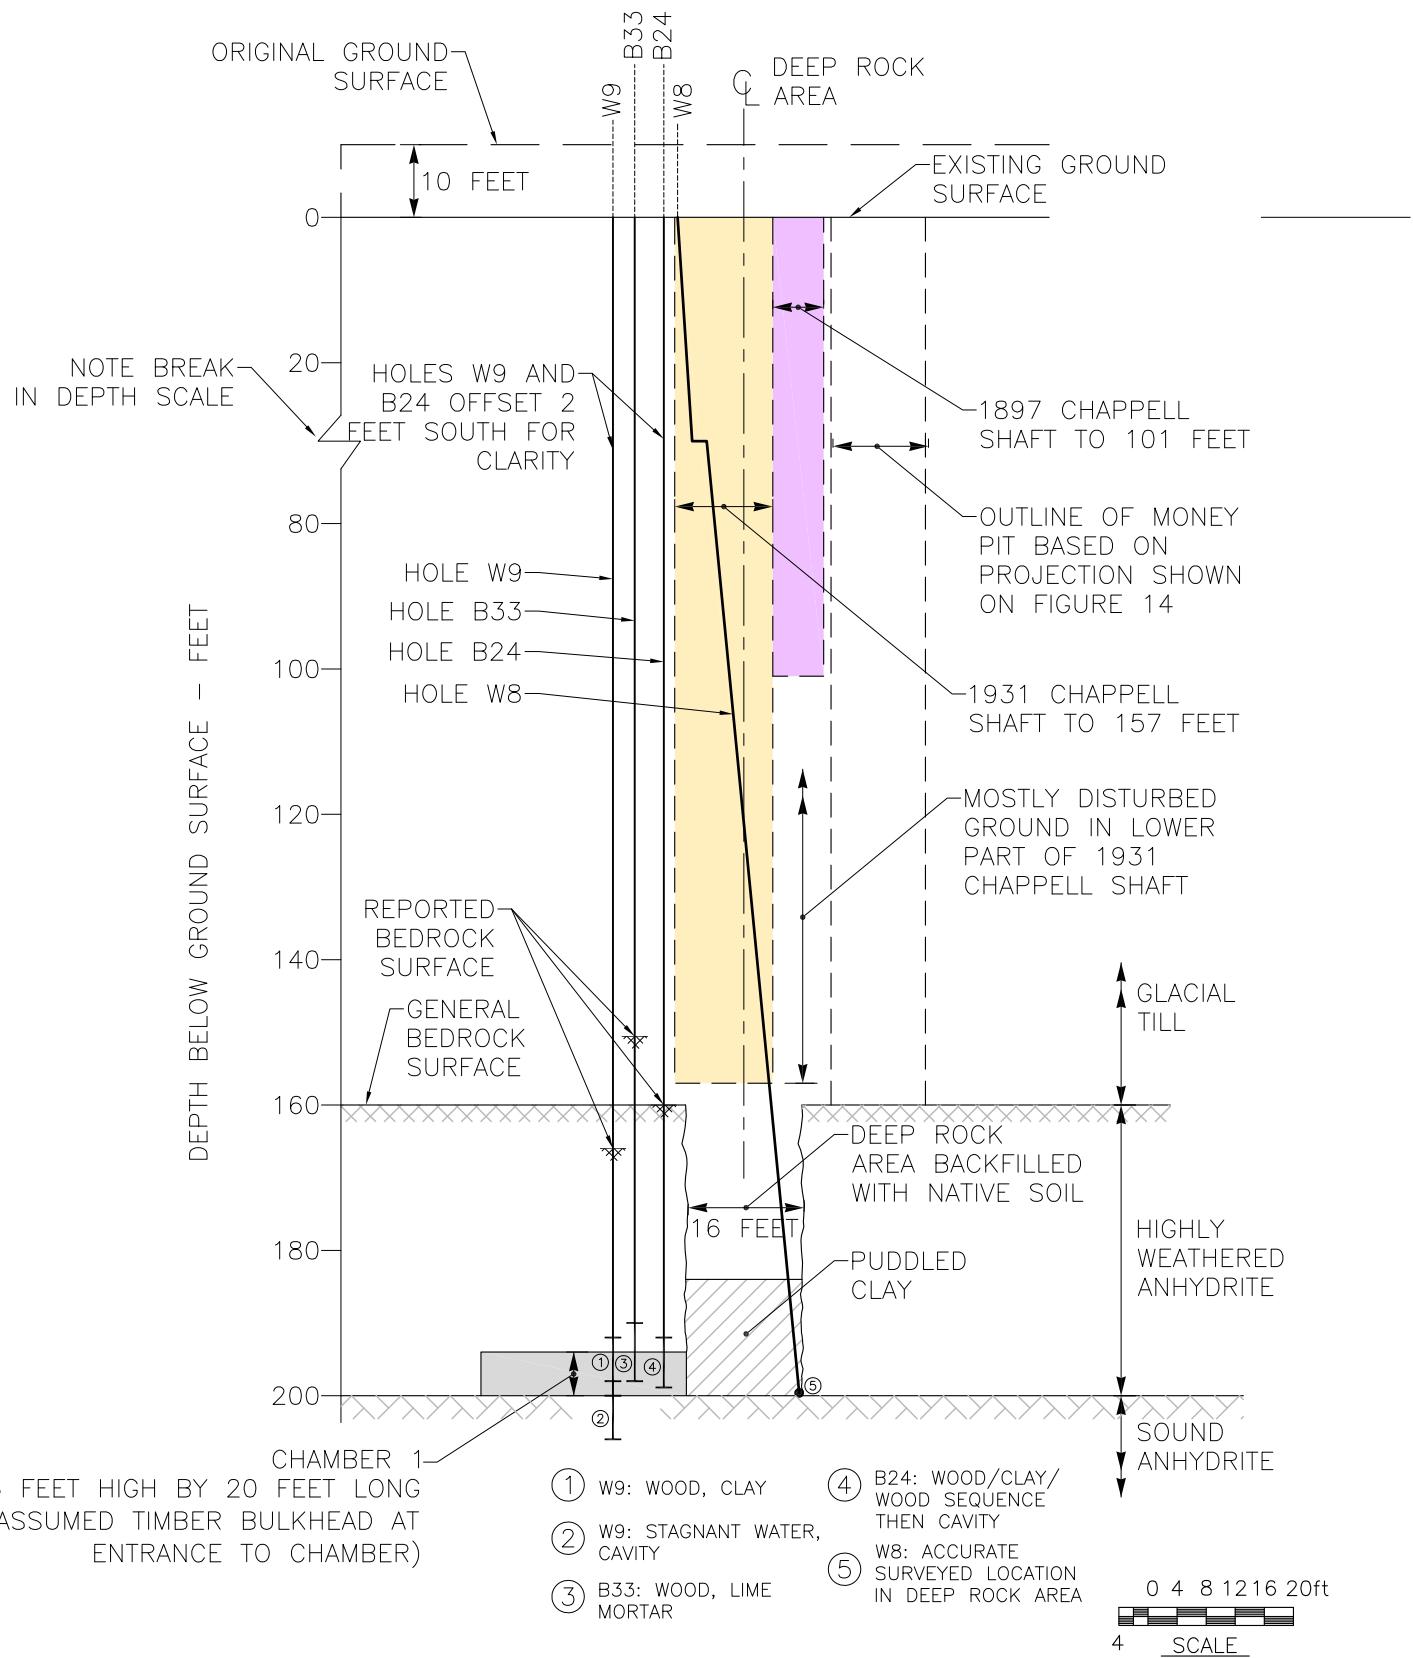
SECTION A-A THROUGH DEEP ROCK AREA AND CHAMBER 1 (LOOKING WEST)
